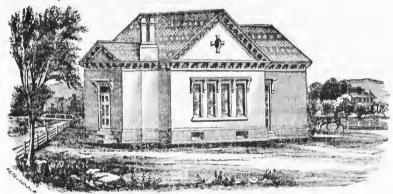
,-Design No. 6,-Adapted to Ground Plan in Fig. 65.
